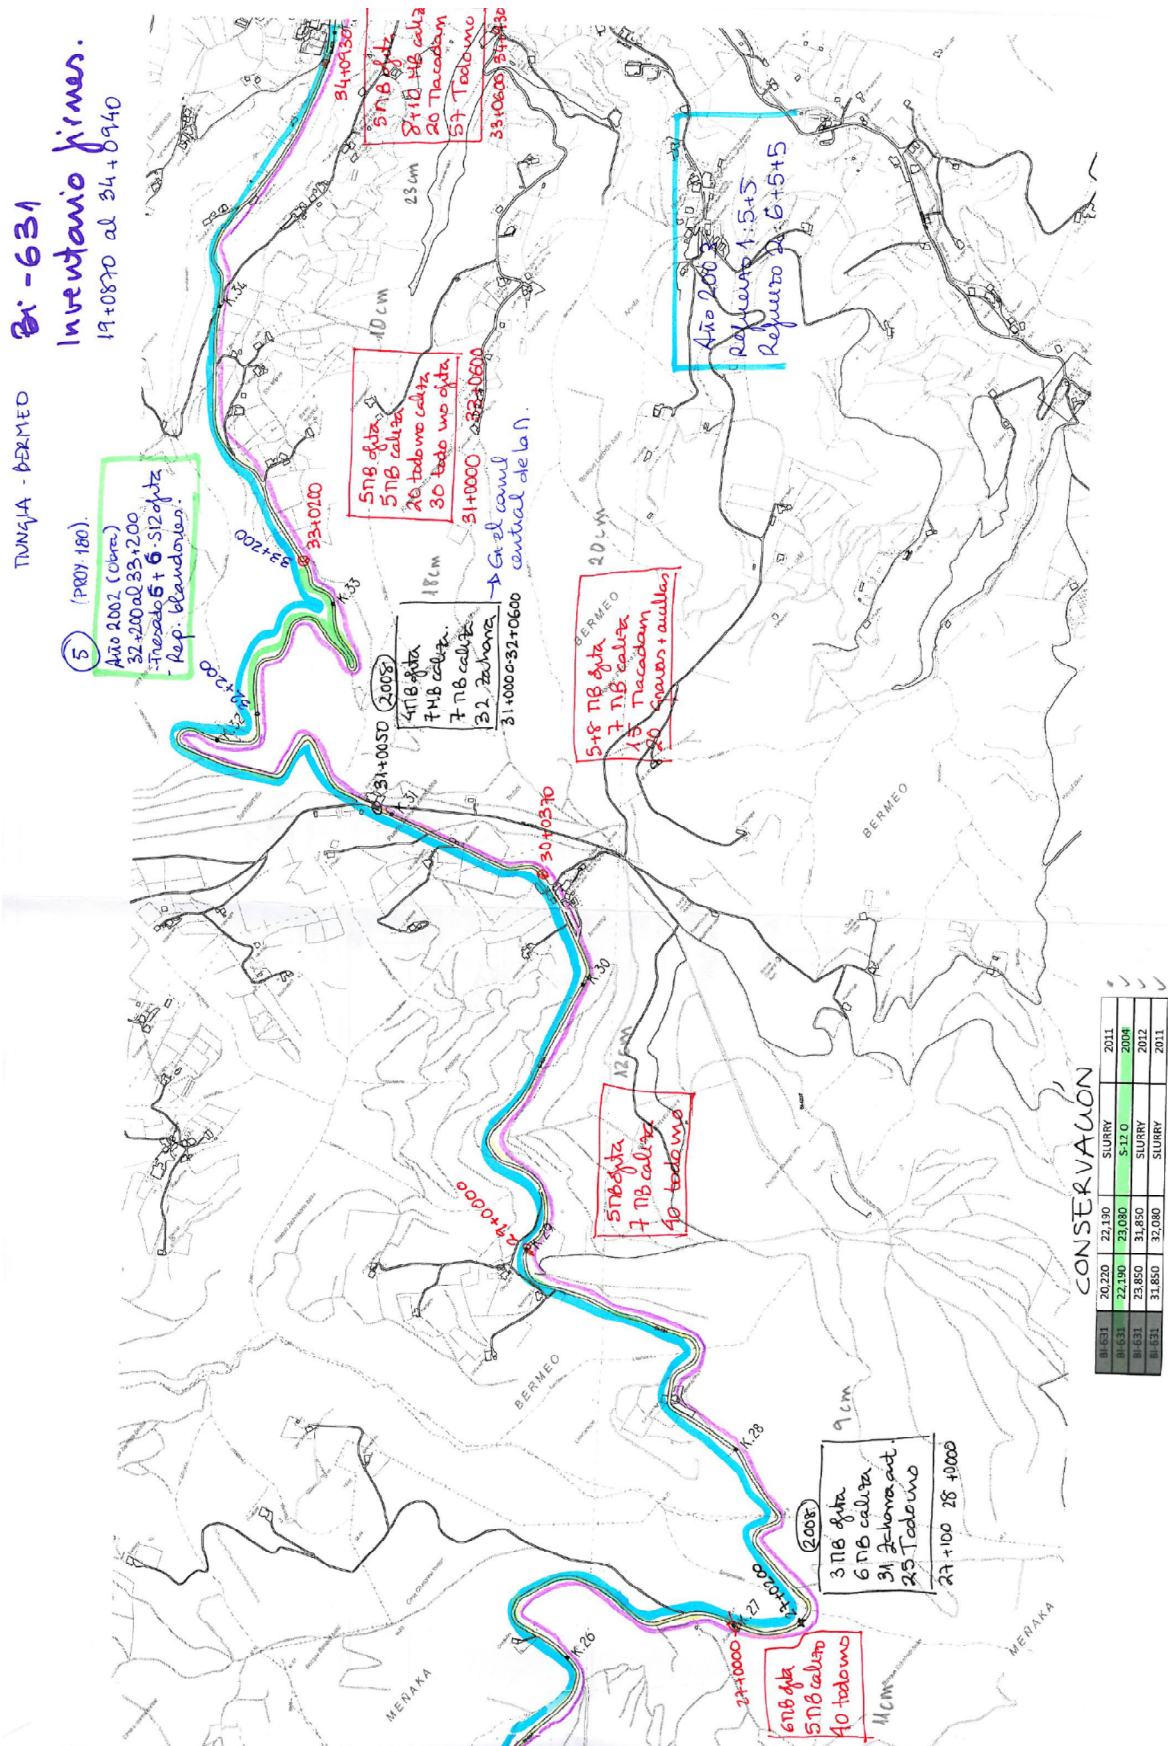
Preliminary scheme of the road BI-631 (stretch Mungia – Bermeo) used by engineers of the UTE Agenda de Estado to observe all the projects conducted in the road (continuation).
